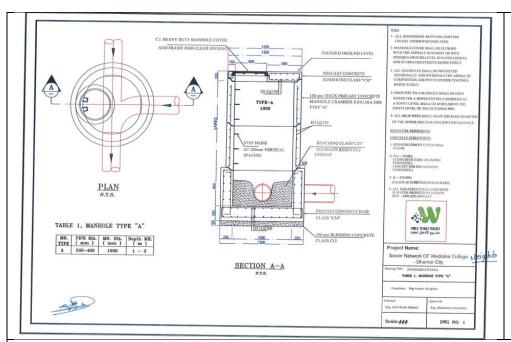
typical cross-section for inspection chambers details and cross-section for a sample of excavation depth.
